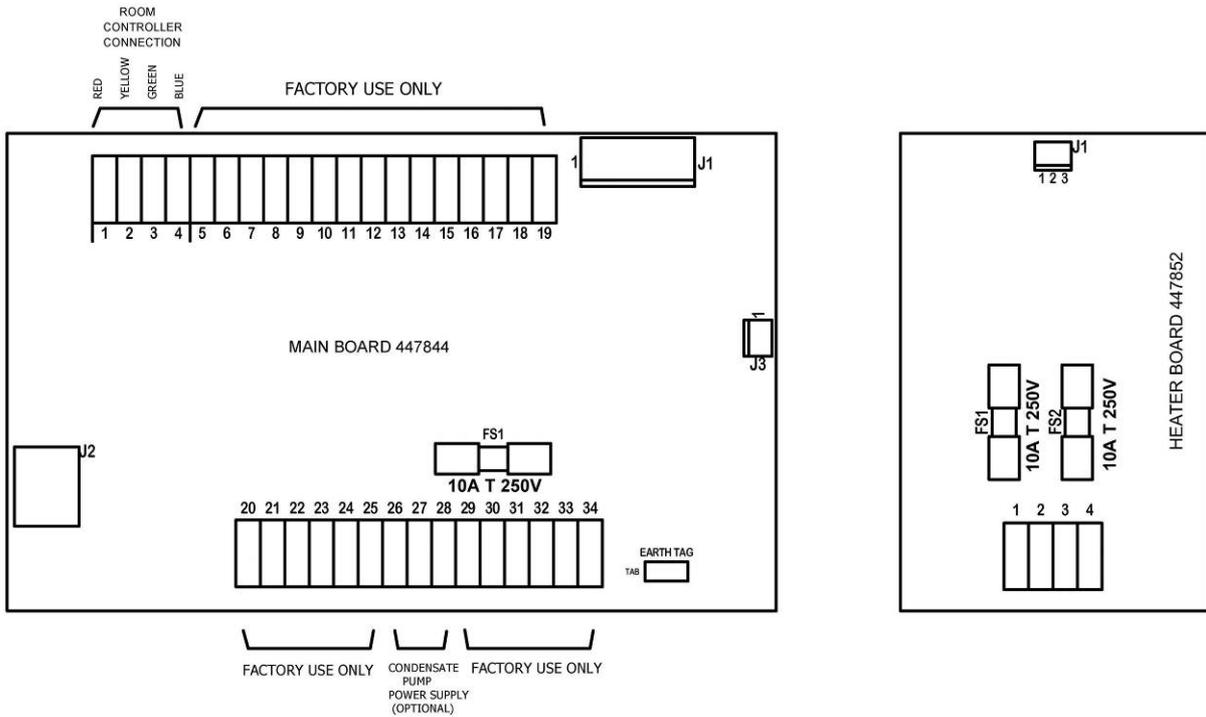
ERV Box (Standard) Main Controller PCB Terminal Connections
